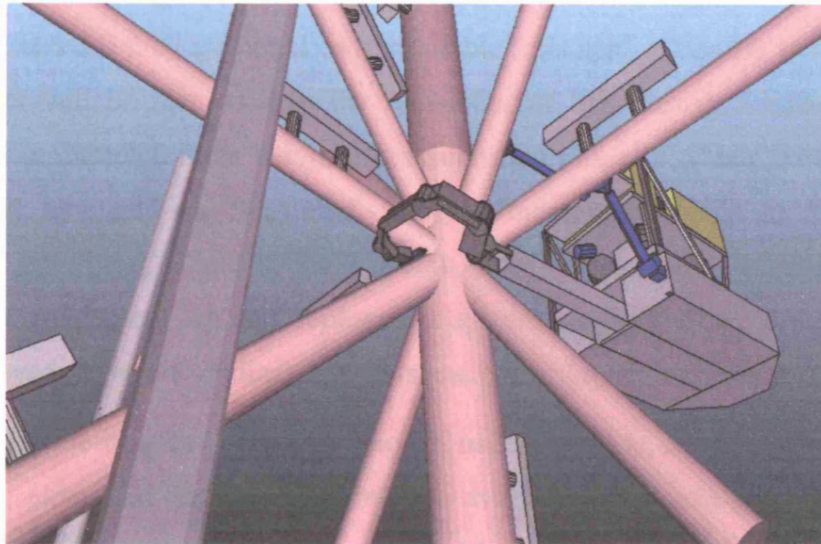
ARM Inspecting an internal nodal weld from outside the platform
